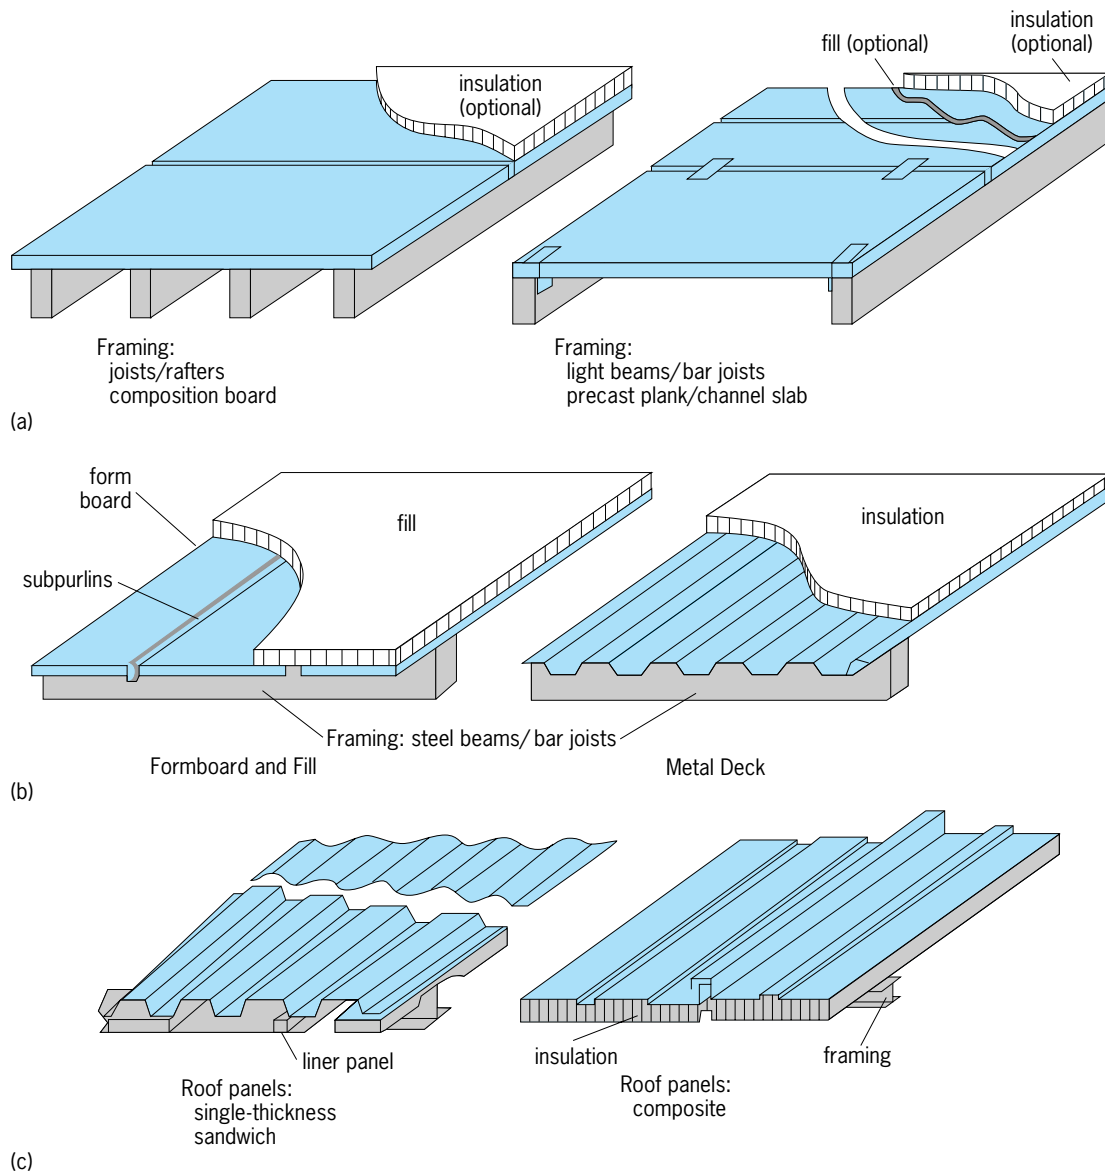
Types of roof deck structure. (a) Site-assembled roof. (b) Flat roof. (c) Combined decking/roofing for a pitched roof. (After Sweets Catalog, The McGraw-Hill Companies, 1993)
